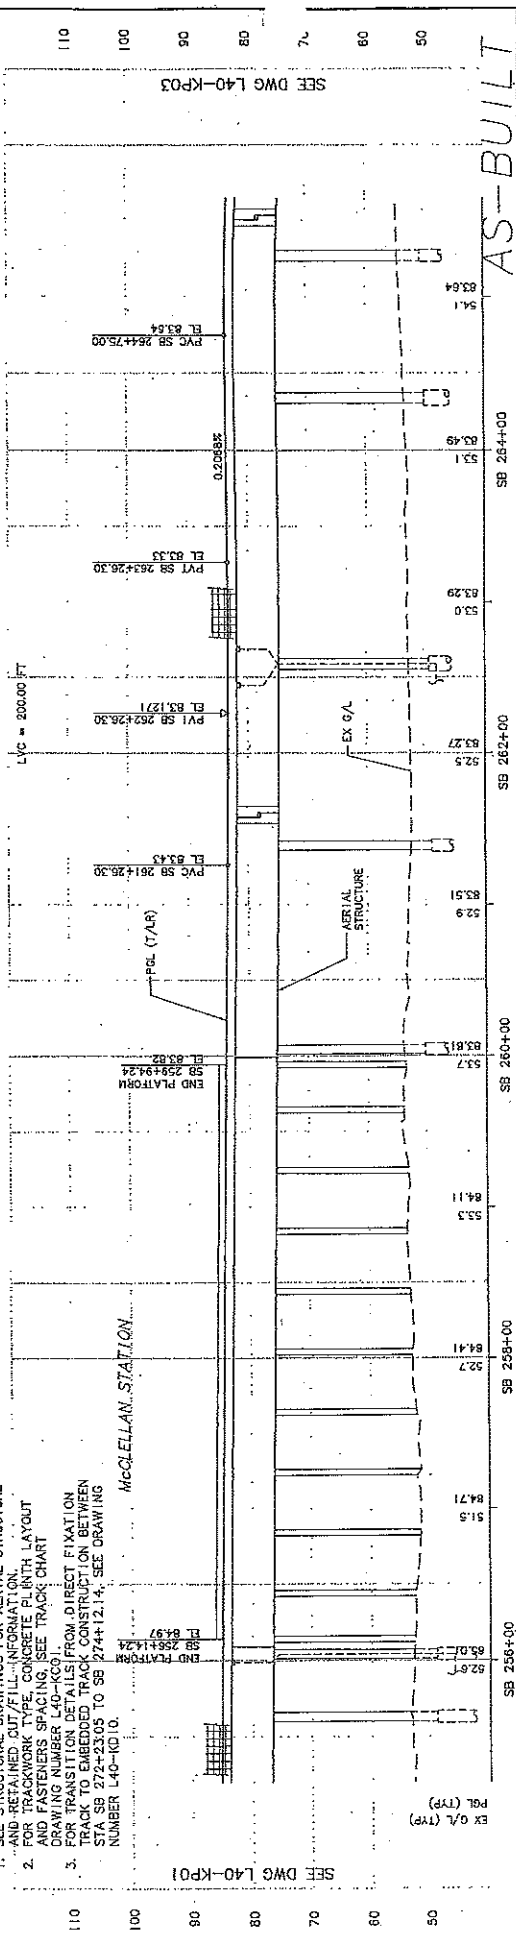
KP01 Sheet No: 23 of 710 Rev: A		LINK LIGHT RAIL PROJECT SOUTH CORRIDOR AERIAL STRUCTURE TRACK PLAN & PROFILE SHEET 1 OF 3 STA SB 250+00 TO STA SB 256+00
